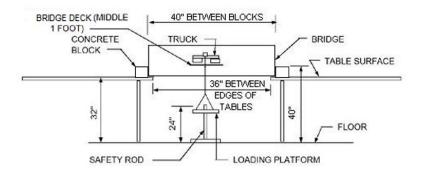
Sketch of Bridge with Roadway Surface through Bridge
